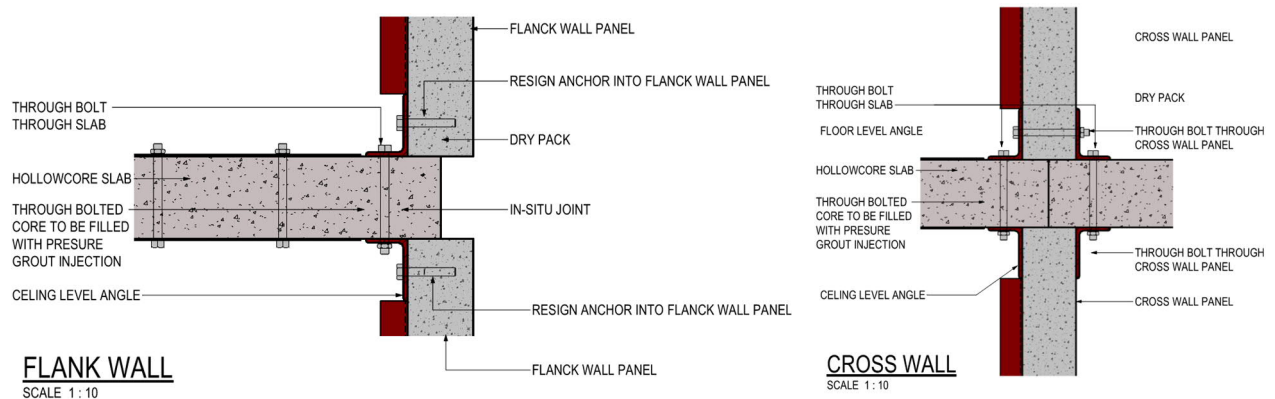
Typical flank and cross wall / slab junction strengthening detail – Bird Block, Nettleton & Dudeney
